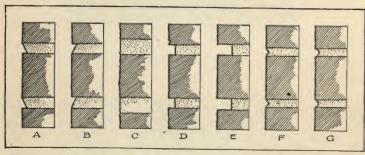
A, struck joint. B, weathered joint. C, flush or plain cut joint. D, raked joint. E, stripped joint. F, "V" joint. G, concave joint.
